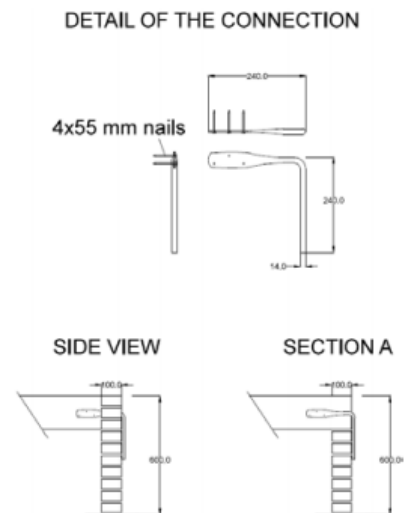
Connection with hook anchor (Mirra & Ravenhorst, 2019)
